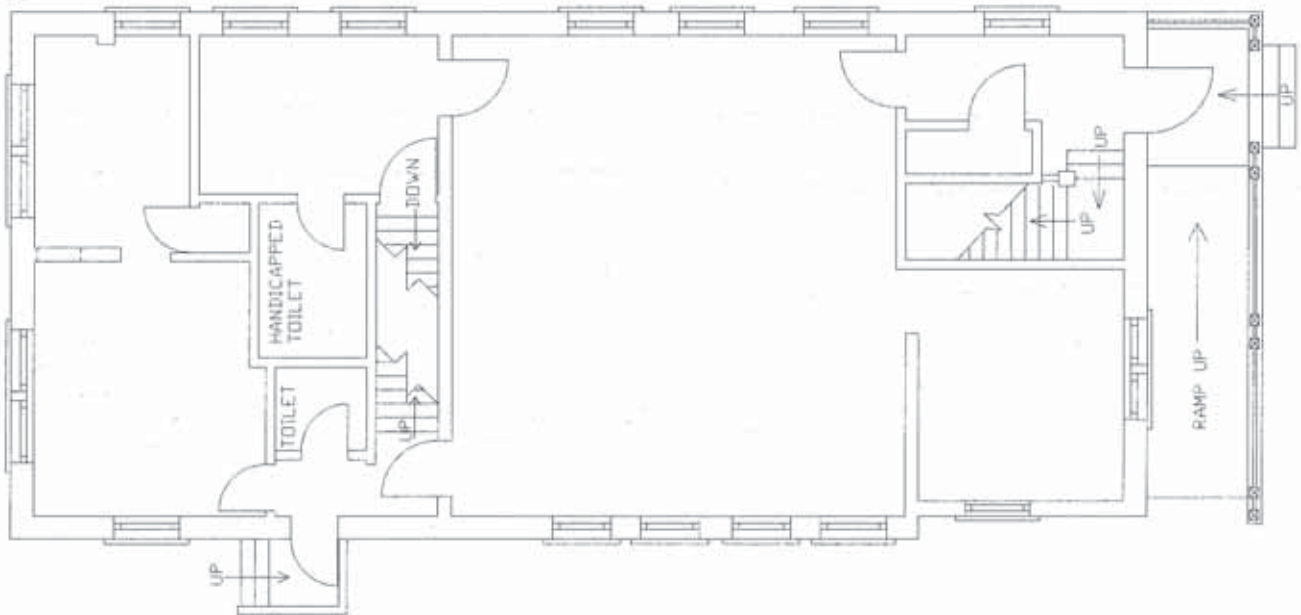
1st Floor Plan from August 1998 Floor Plan drawings, Sheet A-1 (N.T.S.)
